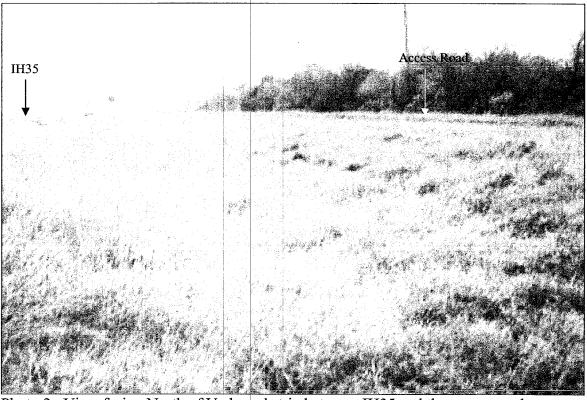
View facing North of V-shaped strip between IH35 and the access road.
